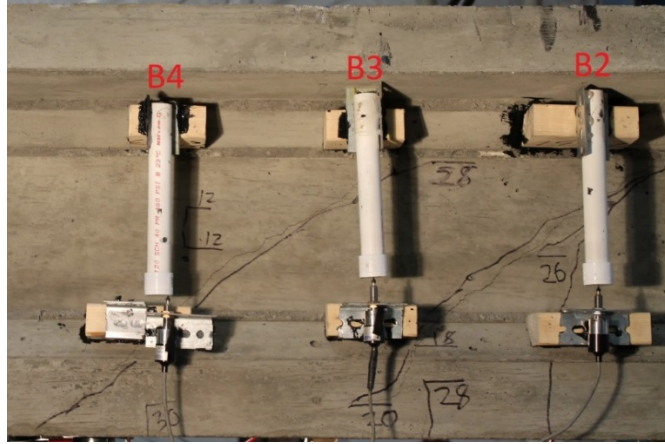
Crack Propagation through LVDTs for Specimen 5 with Typical NEFMAC Reinforcement
